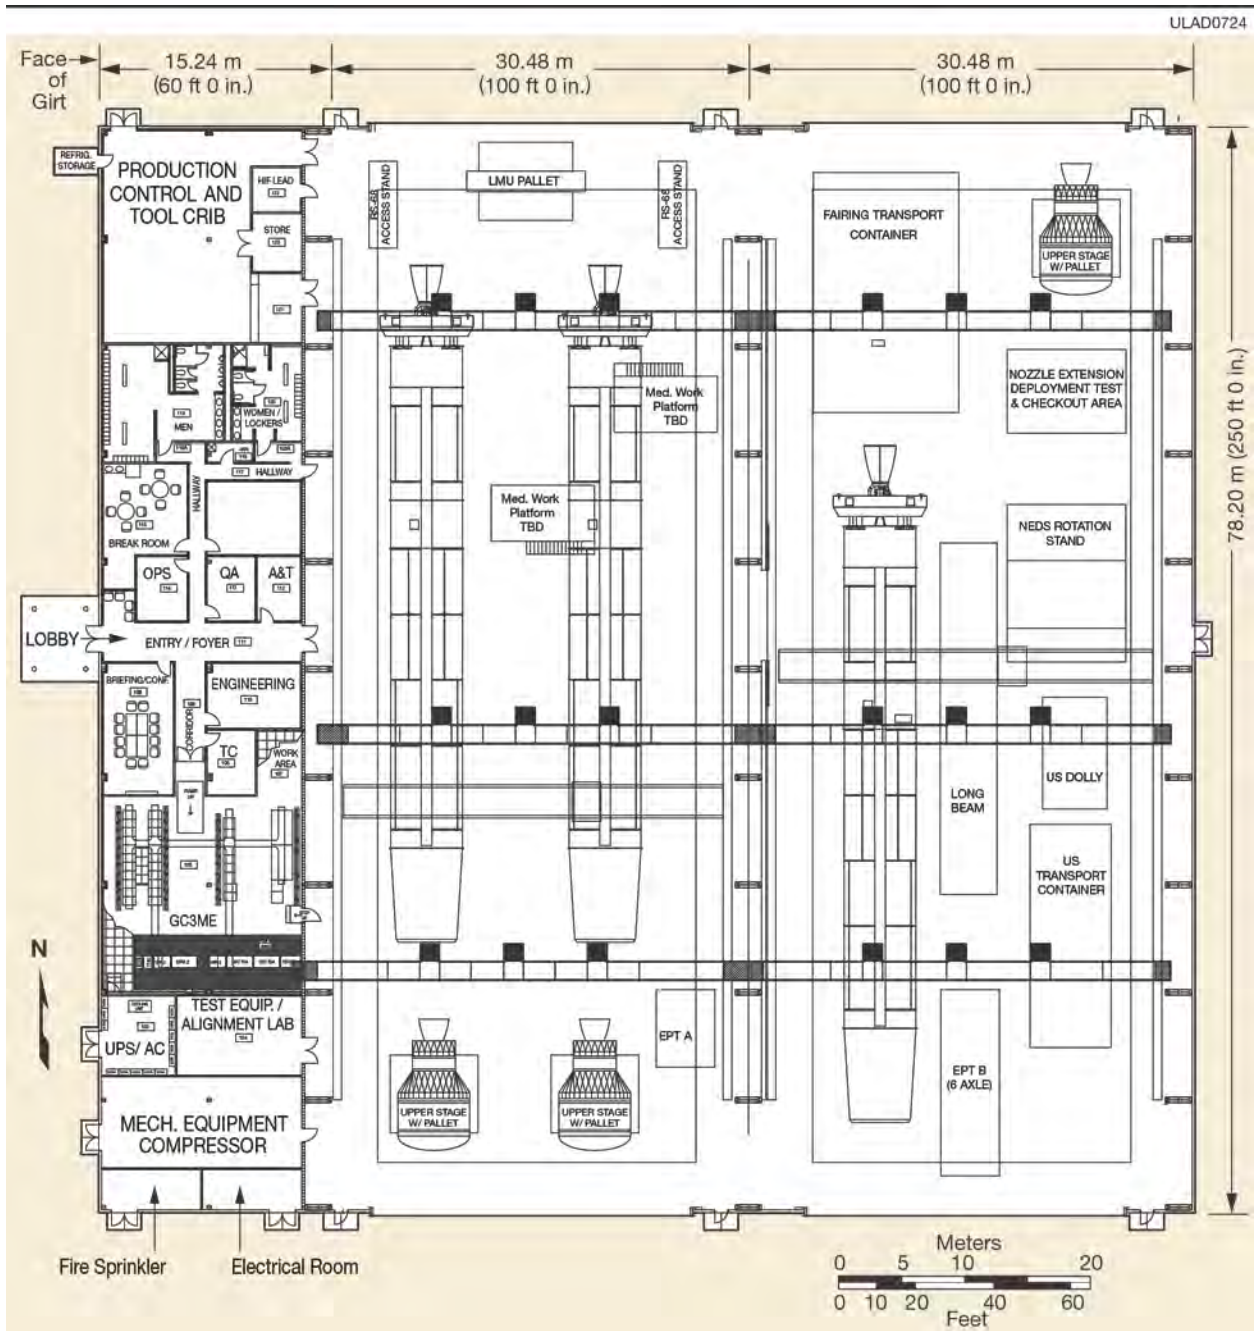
Horizontal Integration Facility (HIF) Floor Plan
